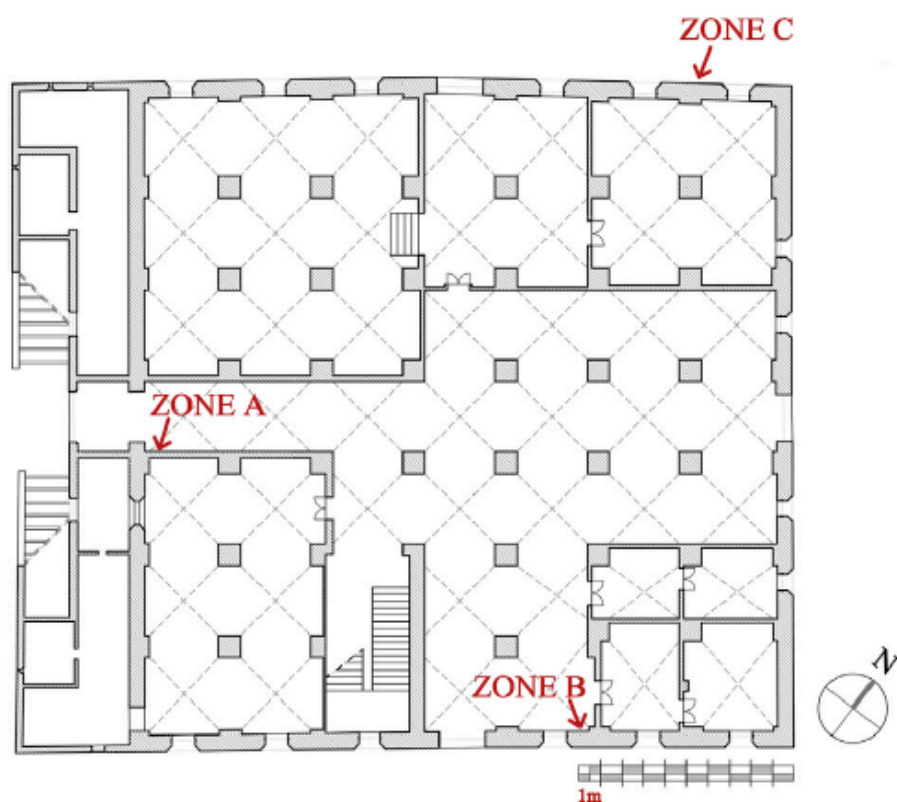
Ground floor plan, with the localisation of the sampling zones A, B and C
